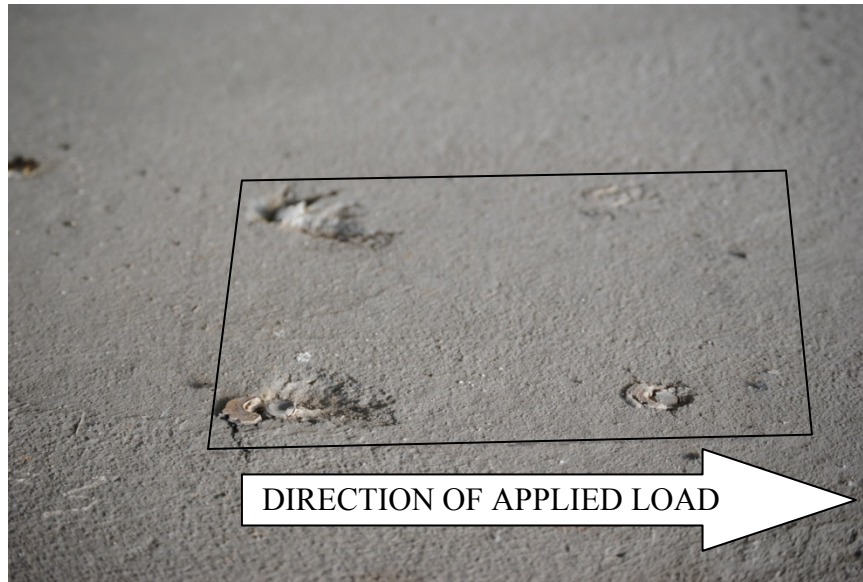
Typical Test Group B Steel Anchor Element Profiles at Concrete Slab Surface after Failure
